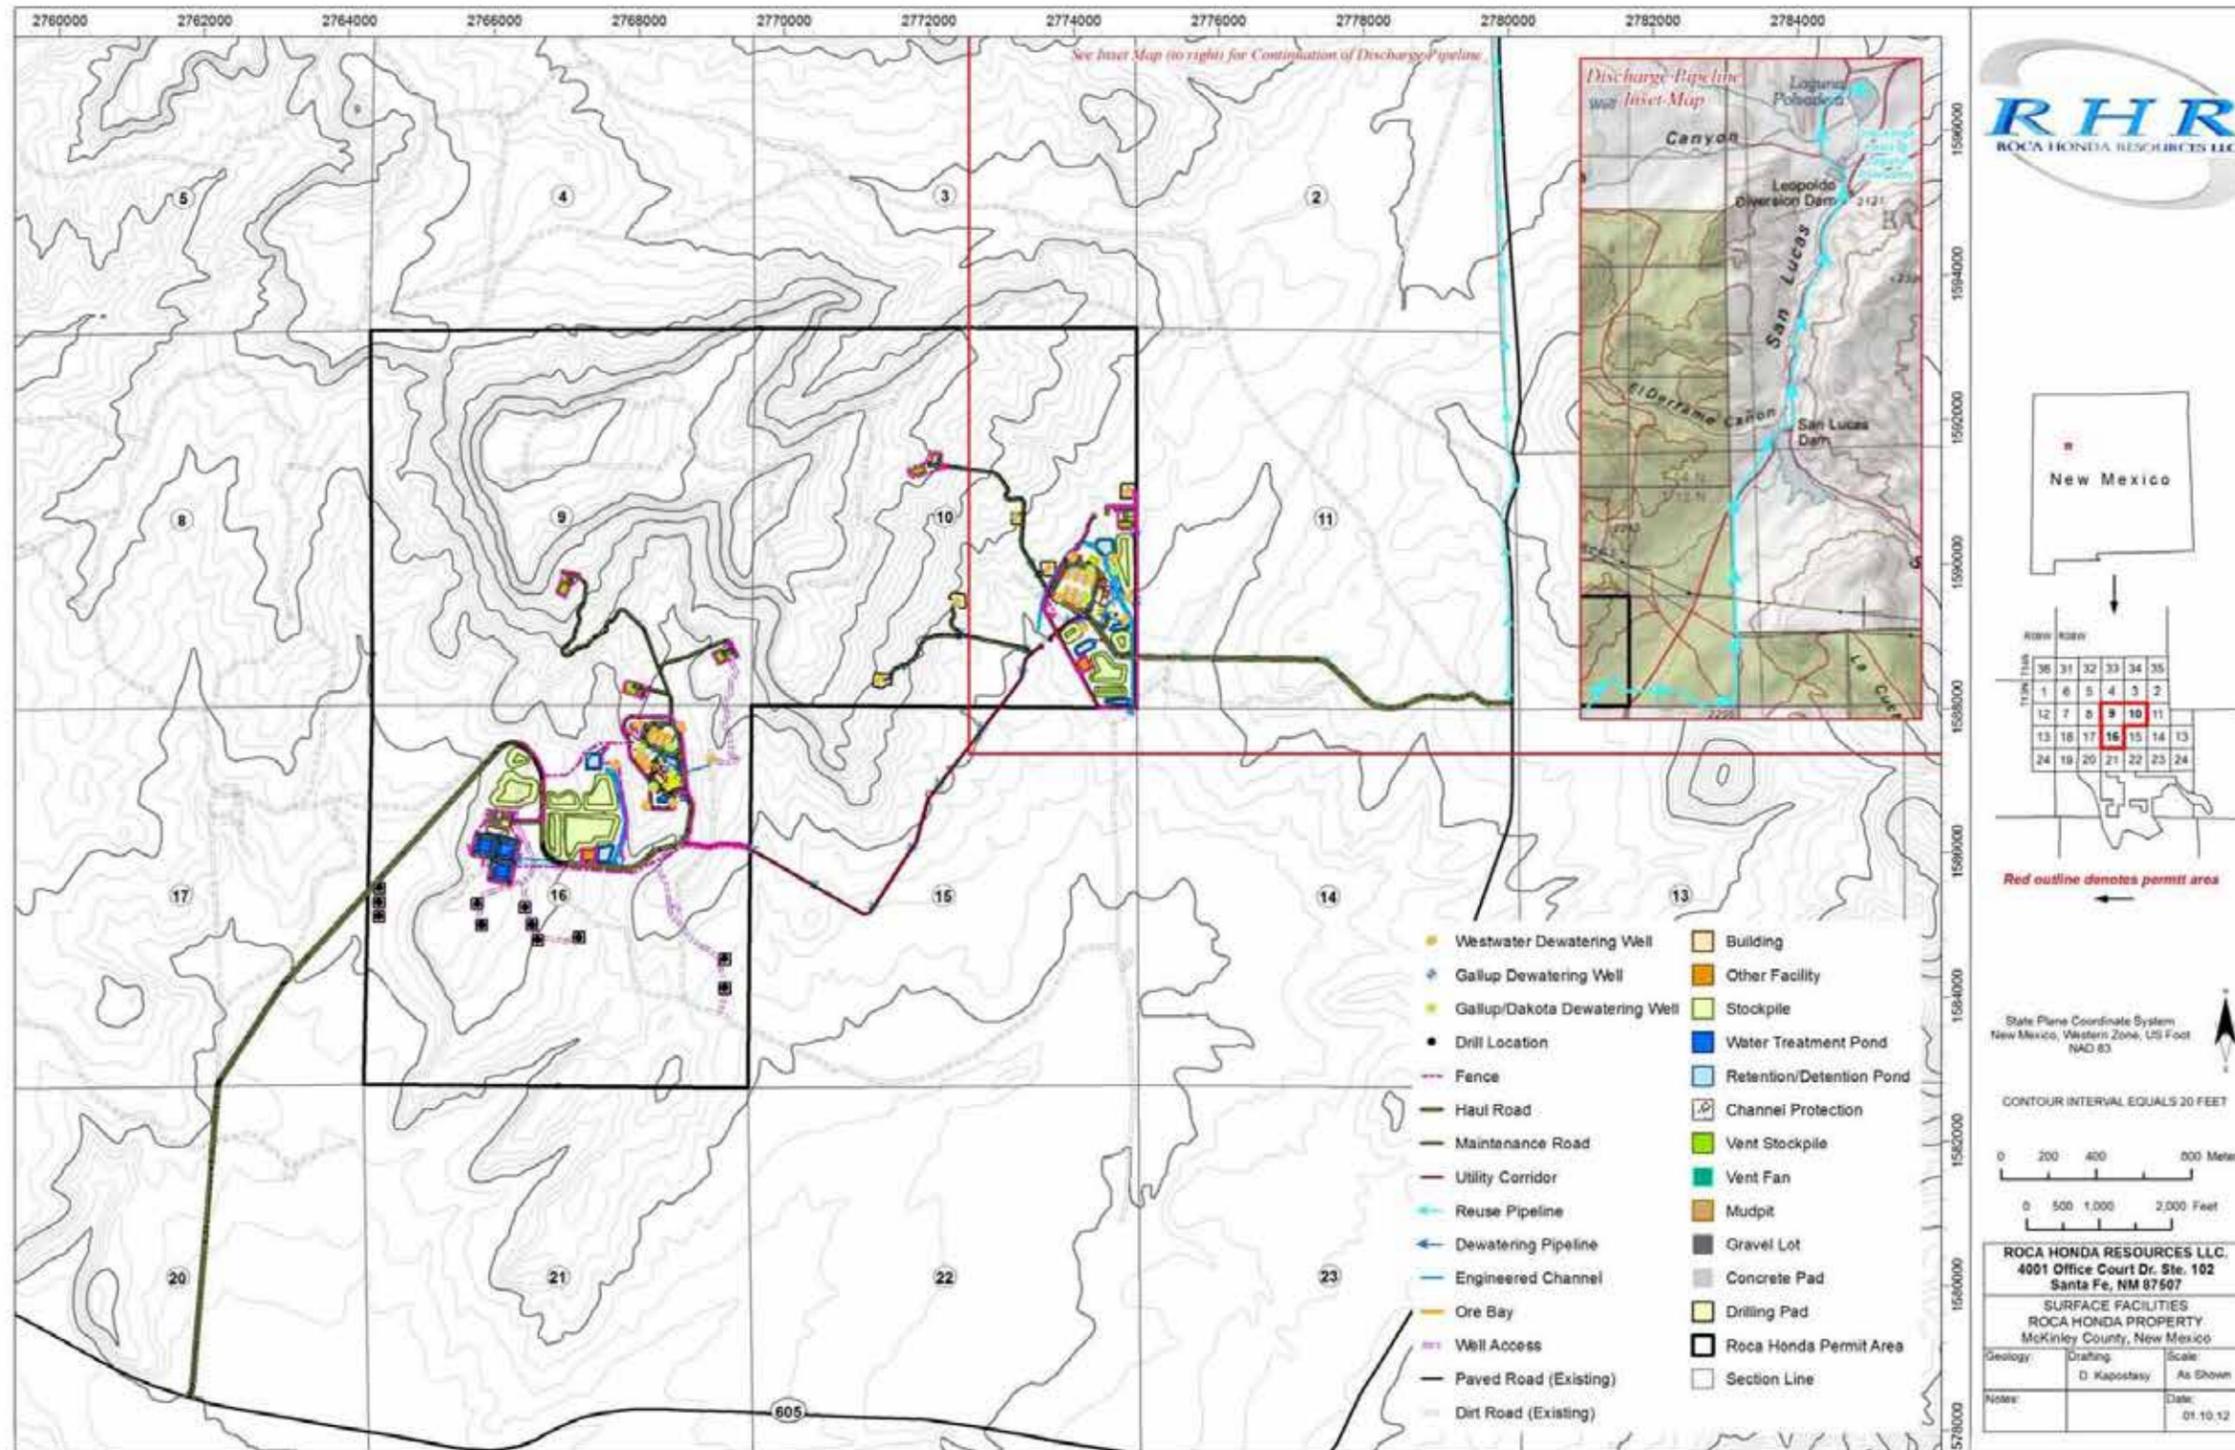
Proposed Roca Honda Mine – layout of surface facilities
